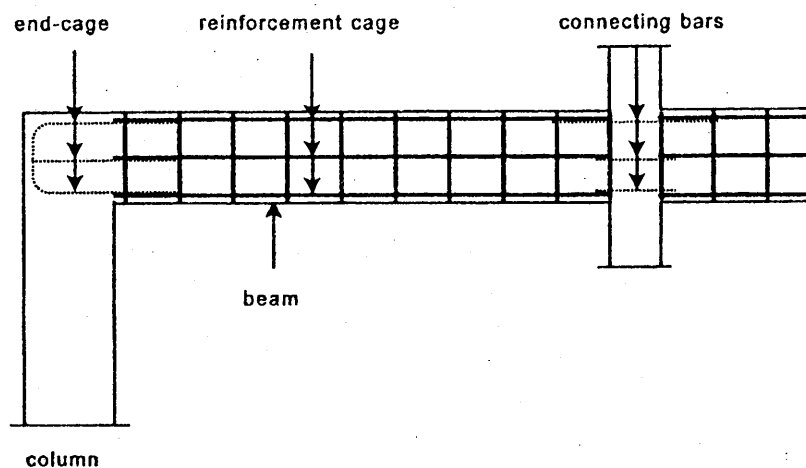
Sketch, showing the standard cage reinforcement for a continuous beam.
